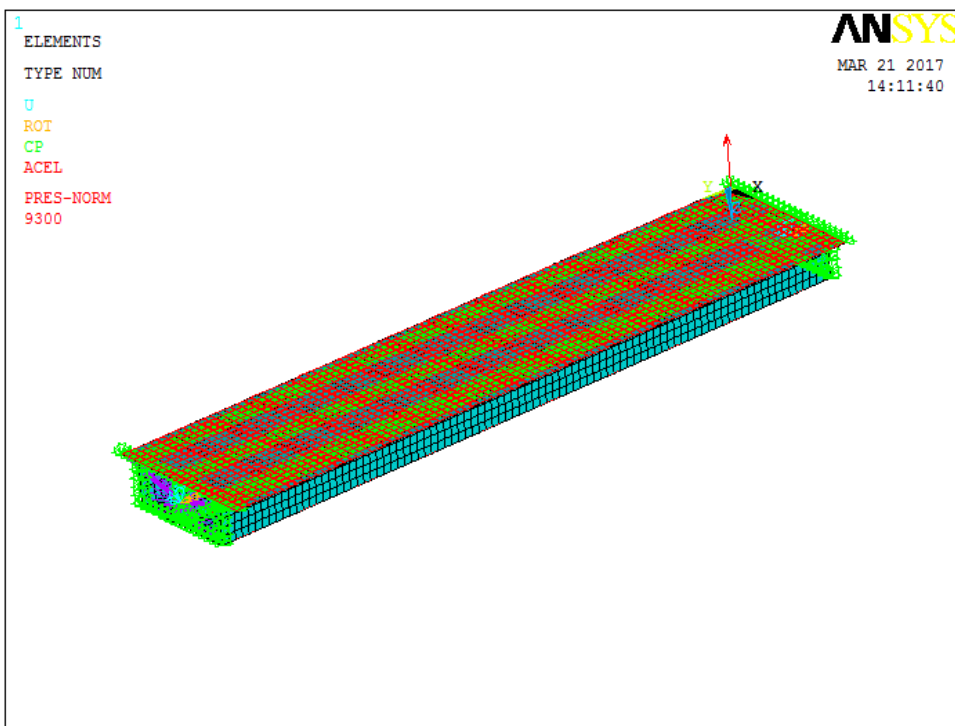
Boundary conditions for straight box girder bridge under loadings.
